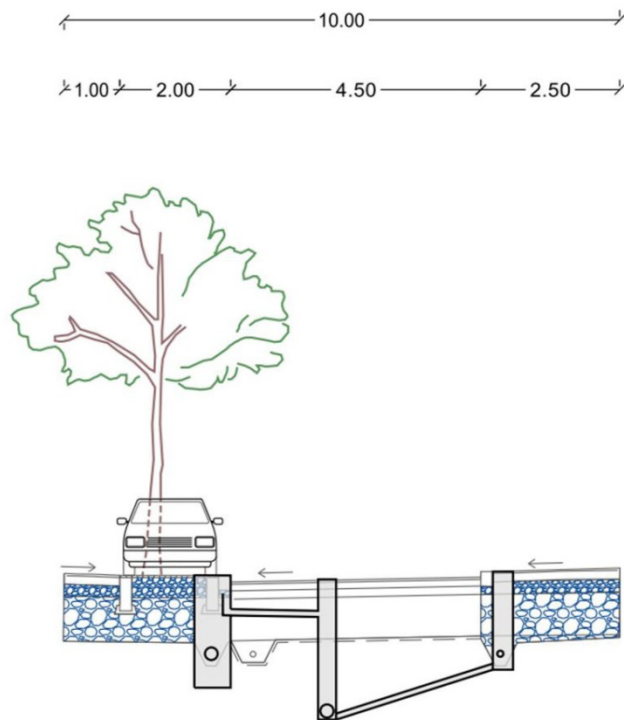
Example on cross section of street Tourukatu (Green Street, Sweco 2016).
